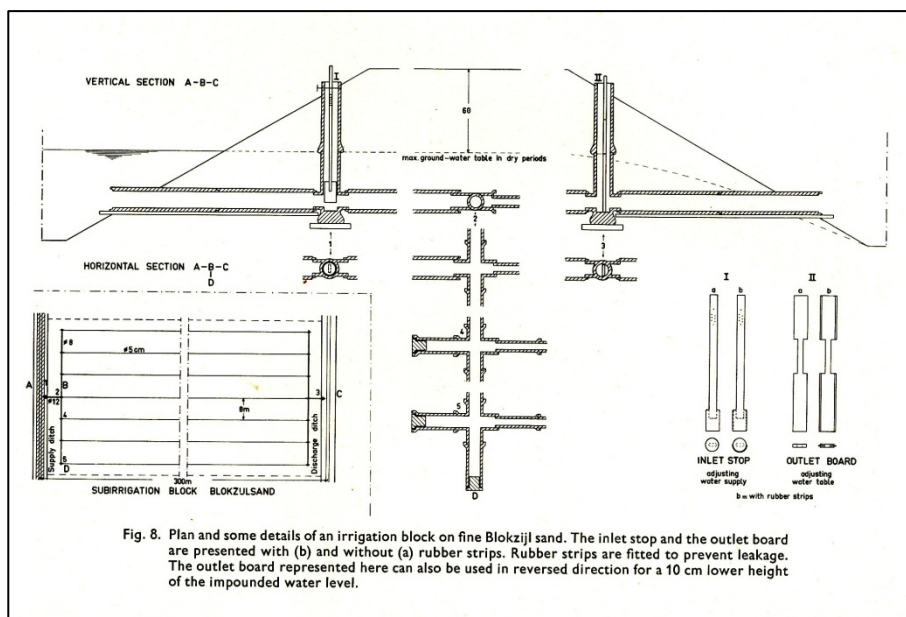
Plan and some details of an irrigation block on fine Blokzand. The inlet stop and the outlet board are presented with (b) and without (a) rubber strips. Rubber strips are fitted to prevent leakage. The outlet board represented here can also be used in reversed direction for a 10 cm lower height of the impounded water level.
